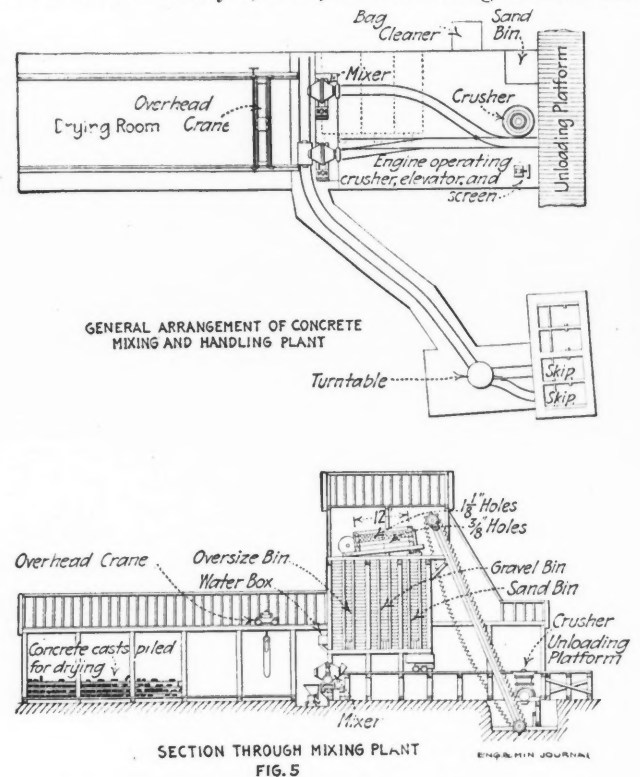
THE SURFACE PLANT FOR CONCRETE MIXING
